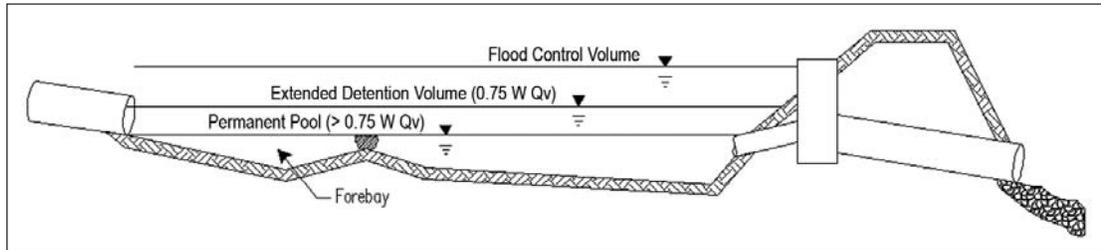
Wet Storm Water Pond with Extended Detention and Flood Control Volumes
